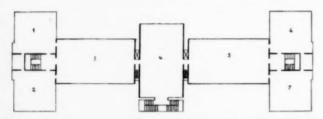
Typical hospital building. The heavy lines indicate existing walls which were susceptible of being developed into fire walls, thus dividing the building into seven sections. In case of a fire occurring in any one of these sections, it would be confined to that section, thus endangering only one-seventh of the building, and necessitating the removal of only one-seventh of its occupants, who can be wheeled to safety into either or both of two adjoining sections. As the stairs and elevators will not be required for the escape of the occupants, they will be available for the use of the fire fighters in reaching the fire promptly.
